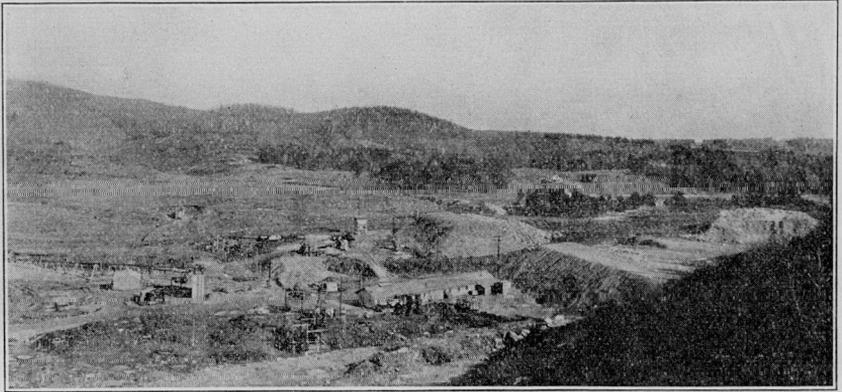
LOOKING NORTHEASTERLY AT DAM SITE
